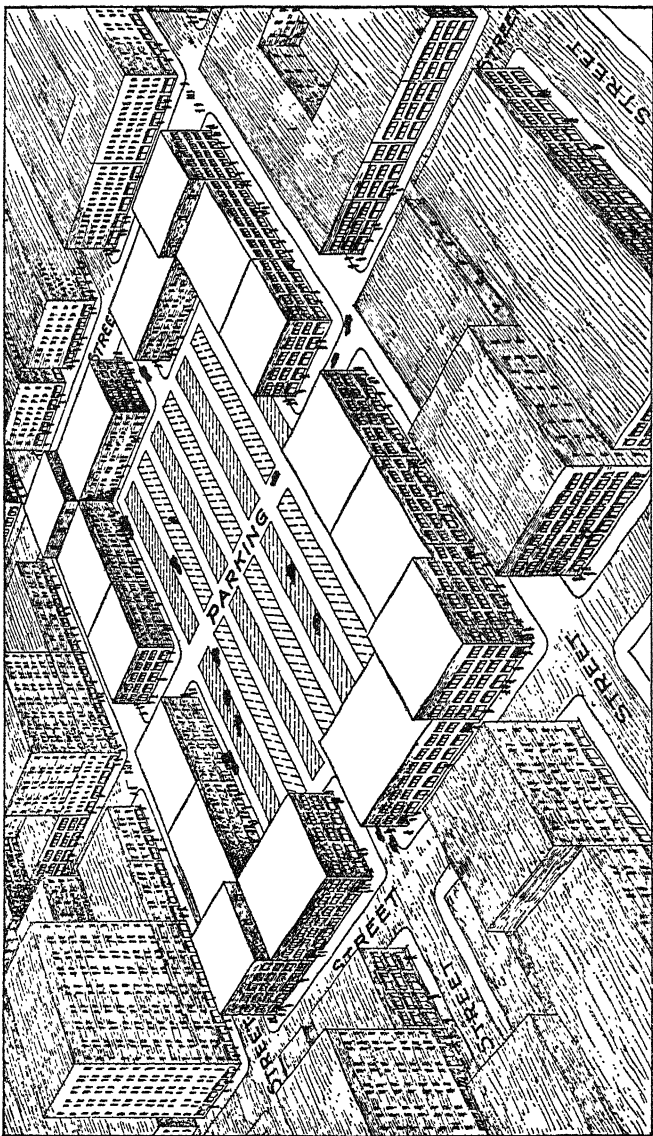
Off-Street Parking Plan Proposed for Milwaukee
